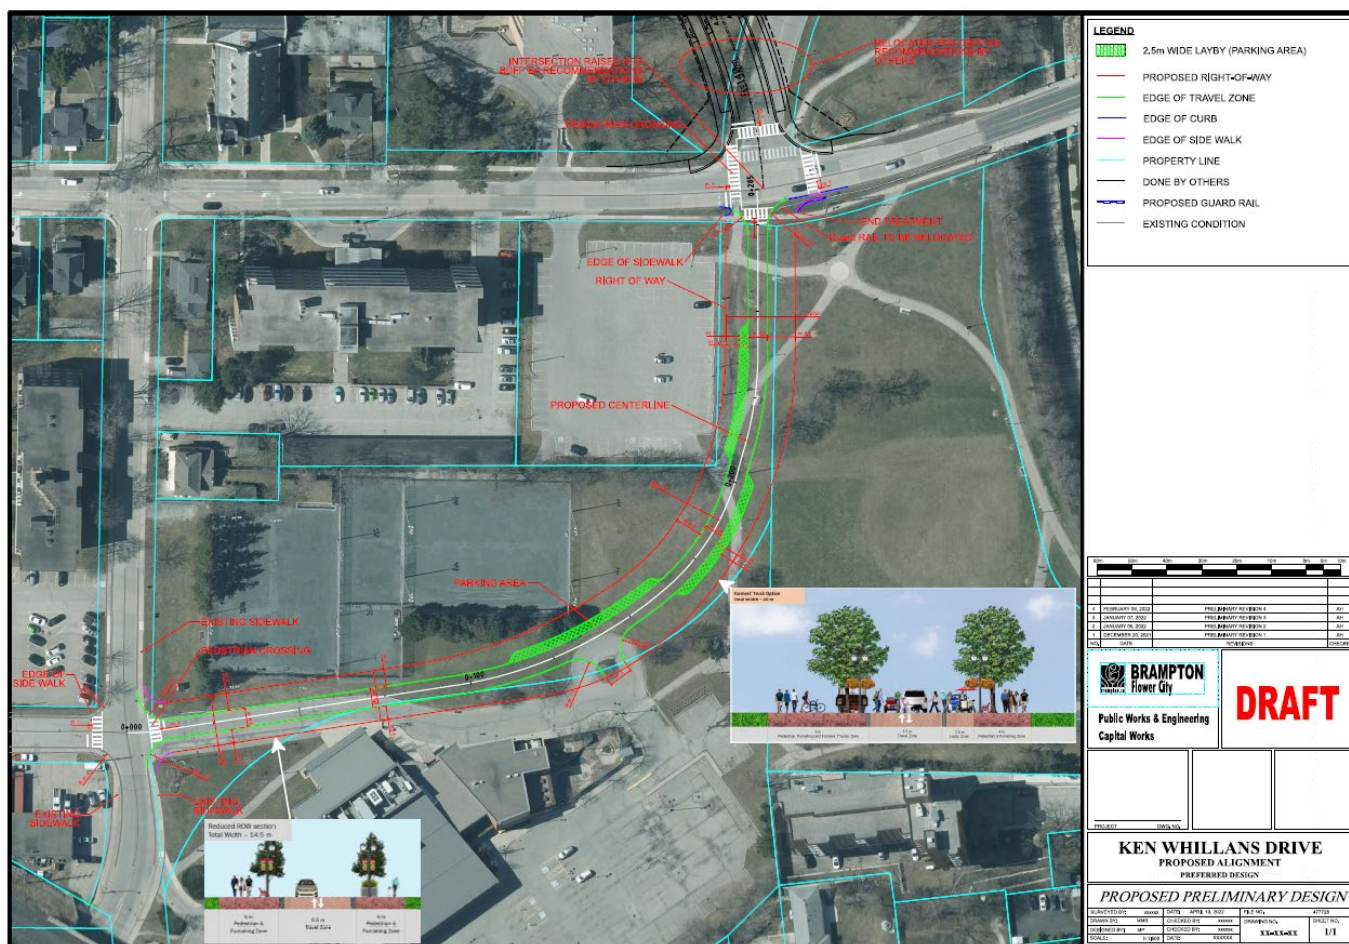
PRELIMINARY DESIGN PLAN FOR THE KEN WHILLANS DRIVE EXTENSION
